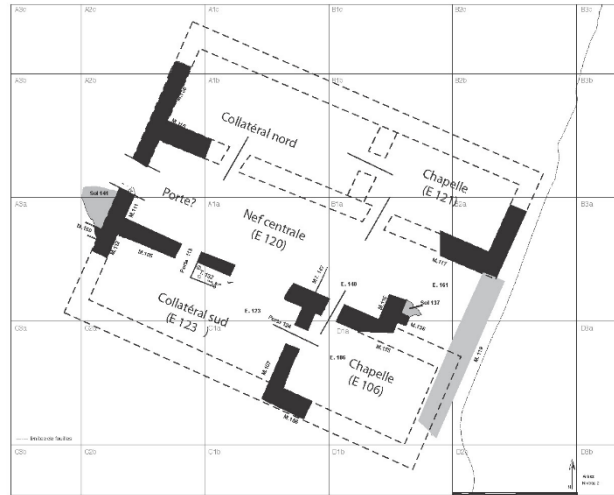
Proposed ground plan of the church at Akkaz. (Gachet-Bizollon 2011)
